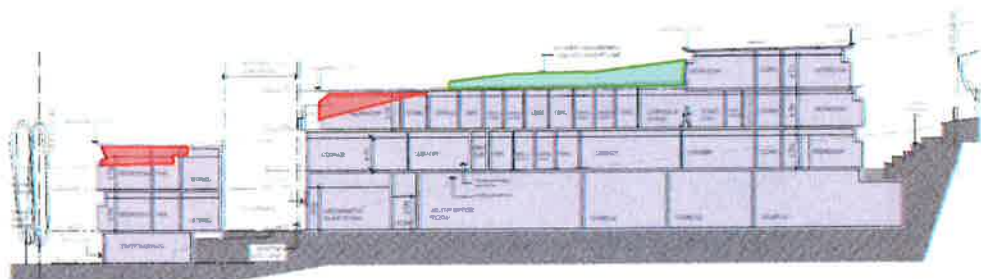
Section of the building showing the areas that exceed the standard (in red) and areas where the building is below the height standard (in green) (Source: MDP Architects)
